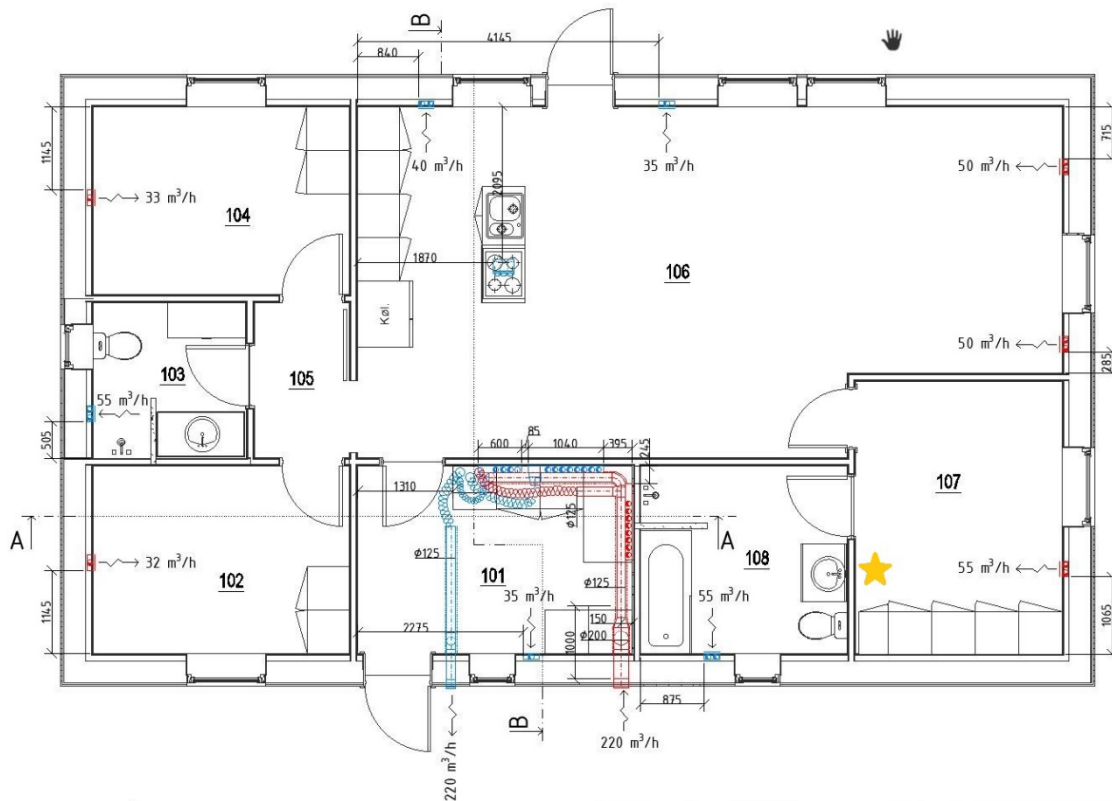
Building 2 - Ventilation schematics - Floor plan. The star indicates placement of the IAQ meter.
